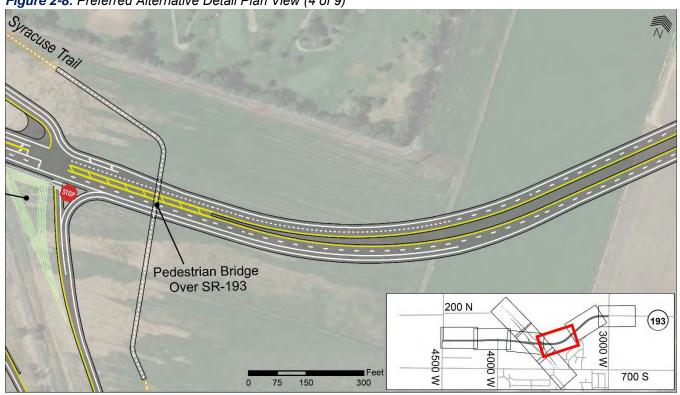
Preferred Alternative Detail Plan View (4 of 9)
